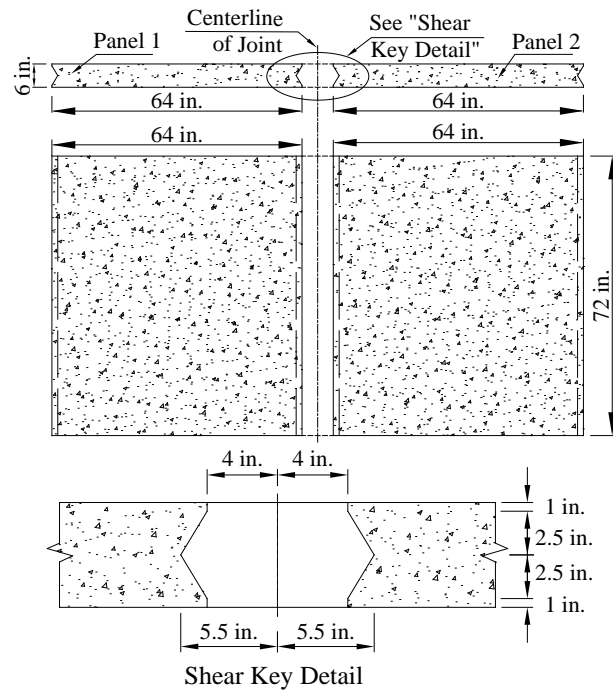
Dimensions of Full-Scale Panel Test Specimen
